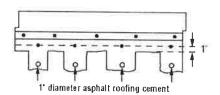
Fastening Presidential and Presidential T/L Sbake sbingles on steep slopes.
